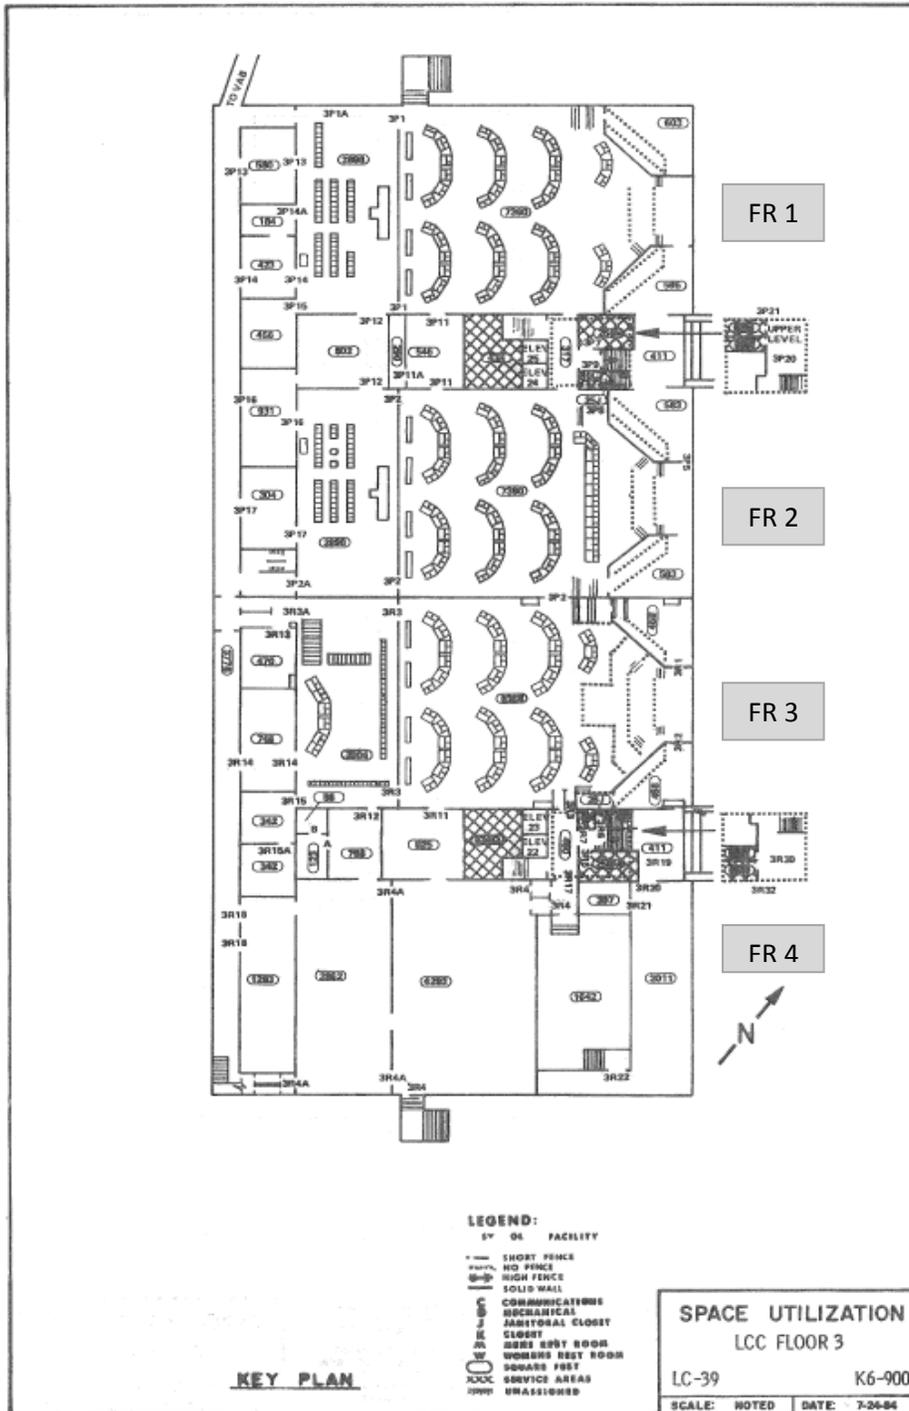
Space Shuttle Firing Room Layouts, dated July 24, 1984.
